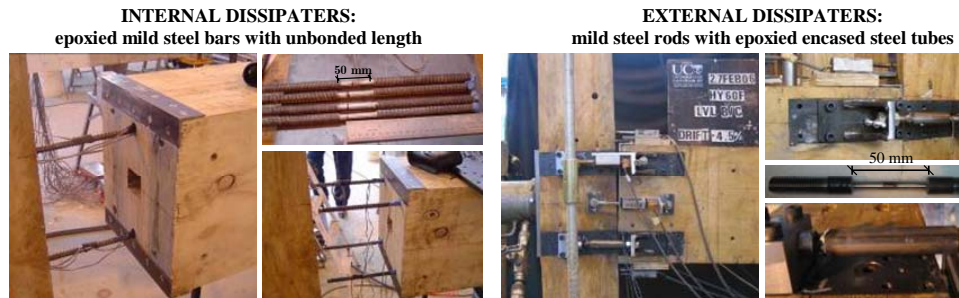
Construction details of beam-column subassemblies with internal and external dissipaters.
